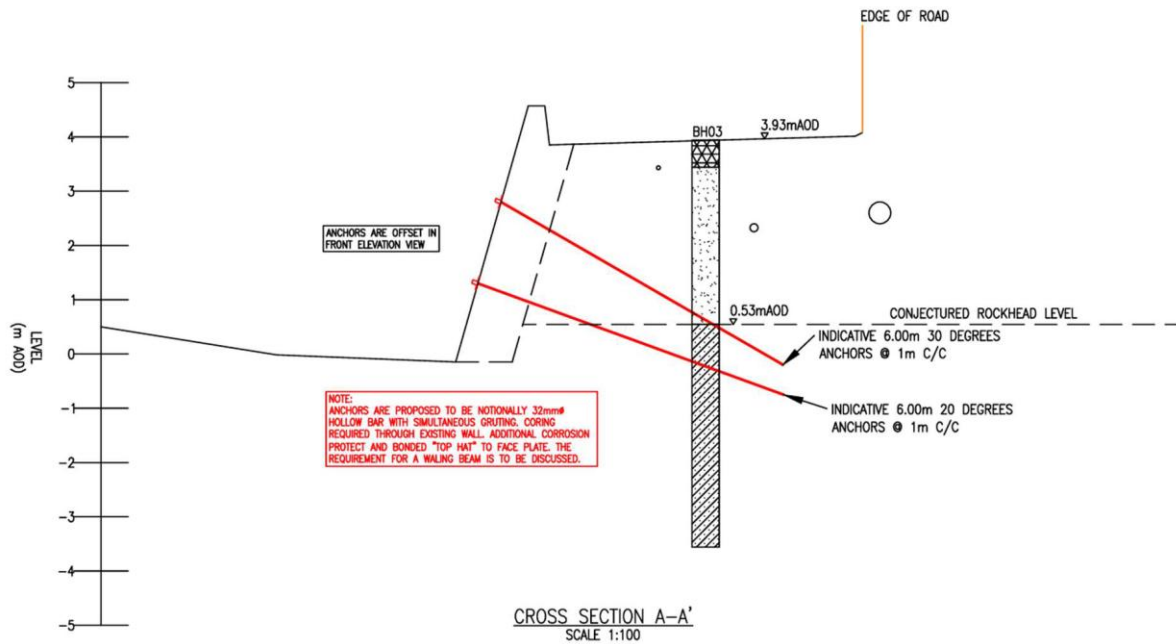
Cross-section drawing showing anchor installation into the retaining wall
